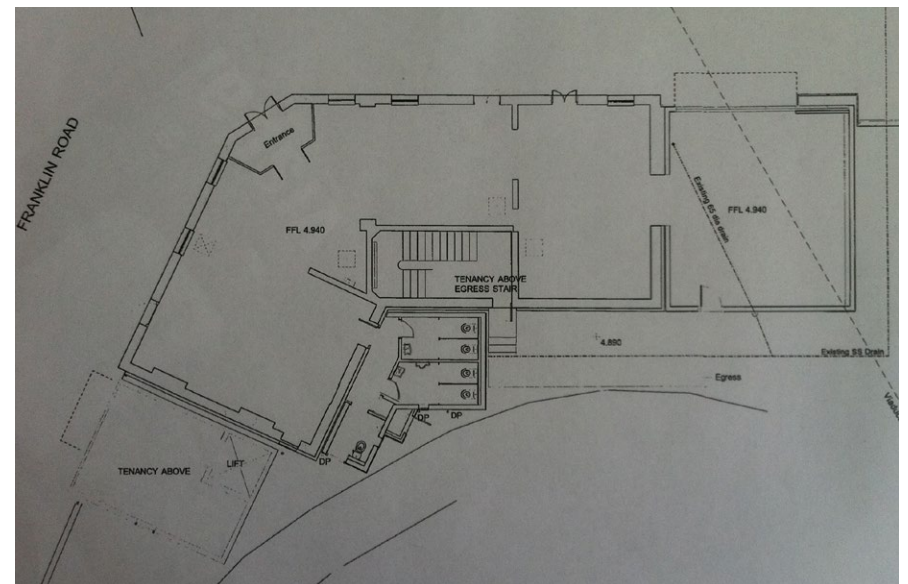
Burgess and Treep. (2011). *Rob Roy ground floor building plan*.
